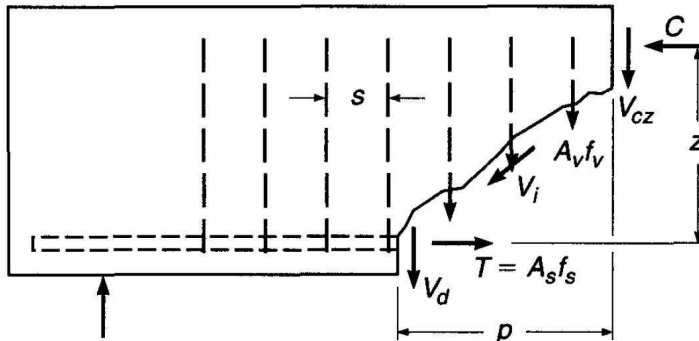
Forces at a diagonal crack in a beam with vertical stirrups.
